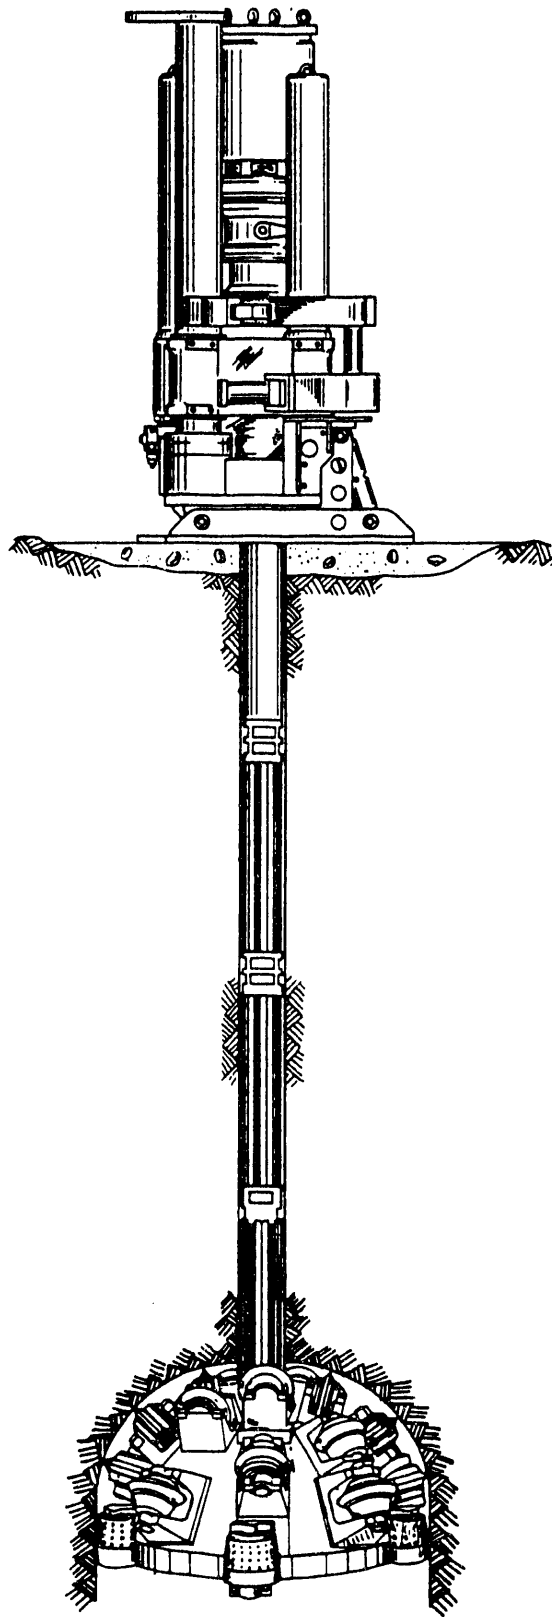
Schematic Drawing of a Raise Drill With a Domed Reamer Head
